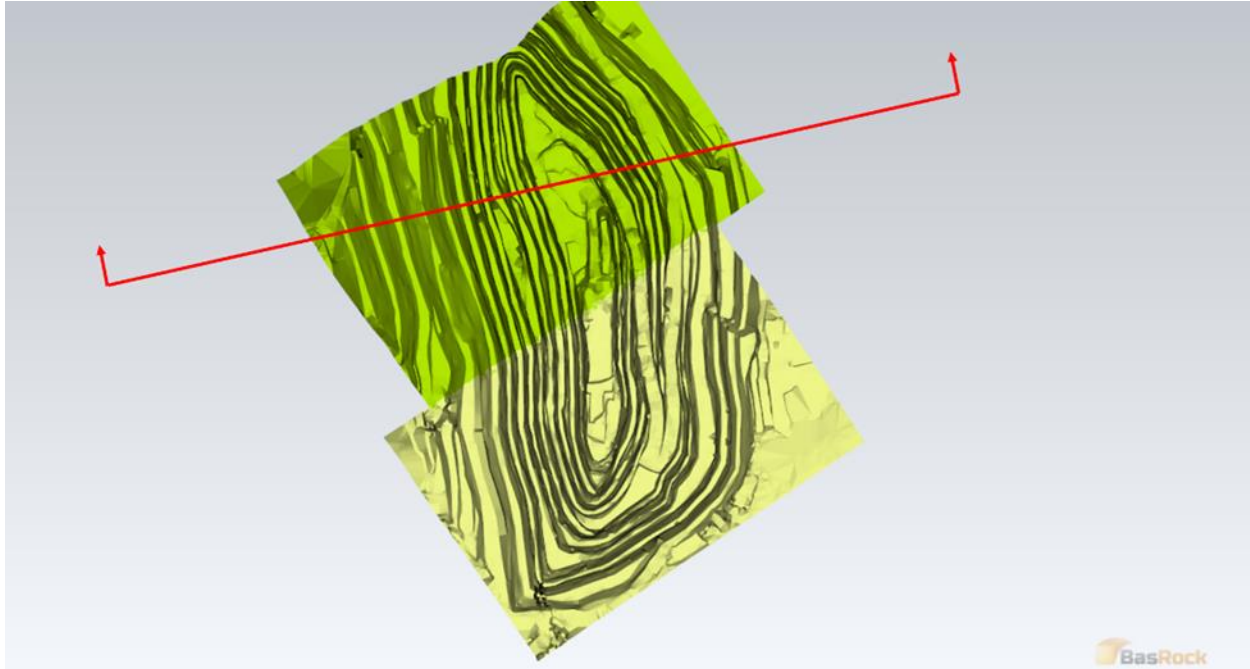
Bibiani Main Pit Central NW Slope Failure Back-Analysis Section
